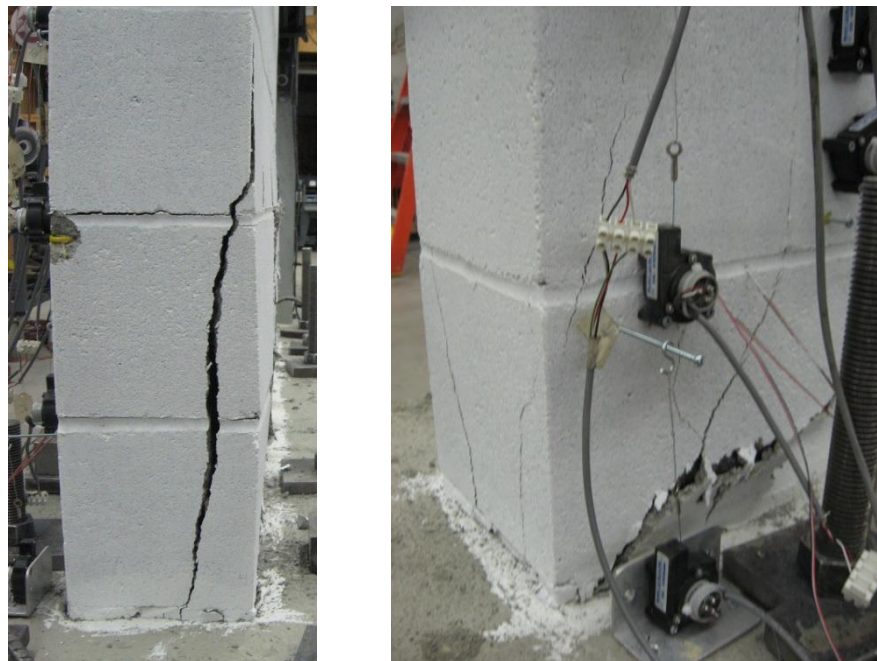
Wall C4: South Toe (Left) and North Toe (Right) at Onset of Toe Damage
